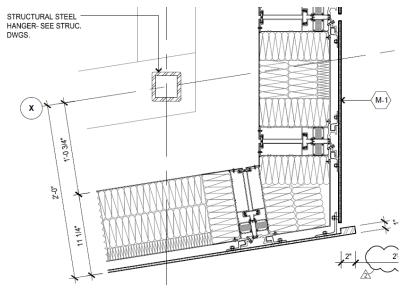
Horizontal section of the metal panel curtain wall. Courtesy of Renzo Piano Building Workshop.
